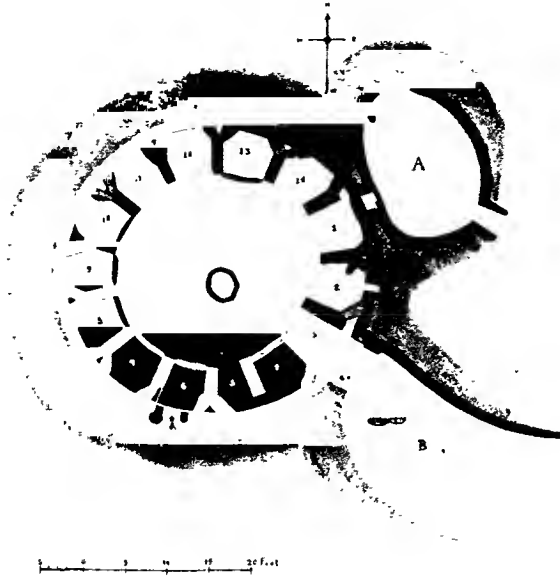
Plan of Earth-house on Machair Leathann, North Uist.
